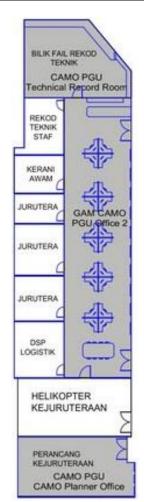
Facility Layout (GAM CAMO PGU Office – Level 1 floor)
